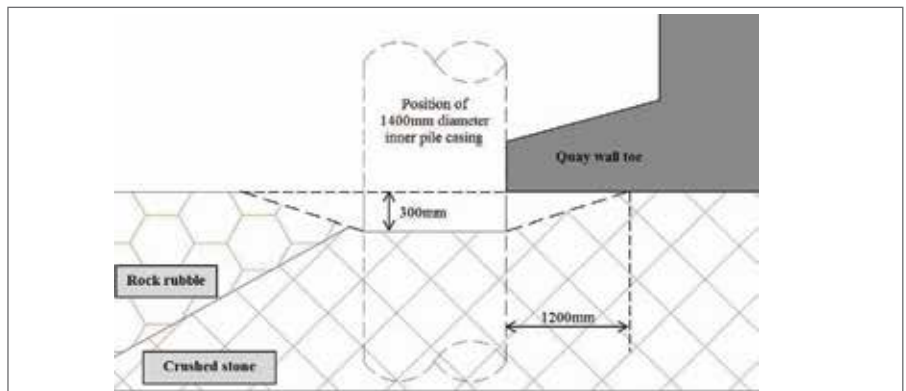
Approximate void size below quay wall toe at Site (Source: Wegener 2013)
